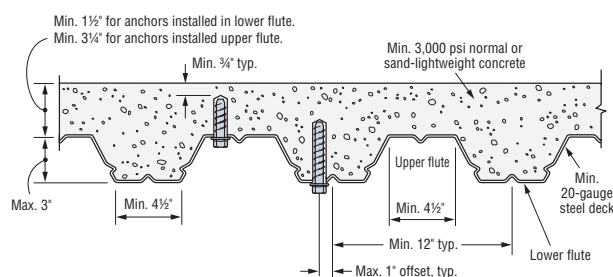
Installation of 3/8"- and 1/2"-Diameter Anchors in the Soffit of Concrete over Steel Deck
